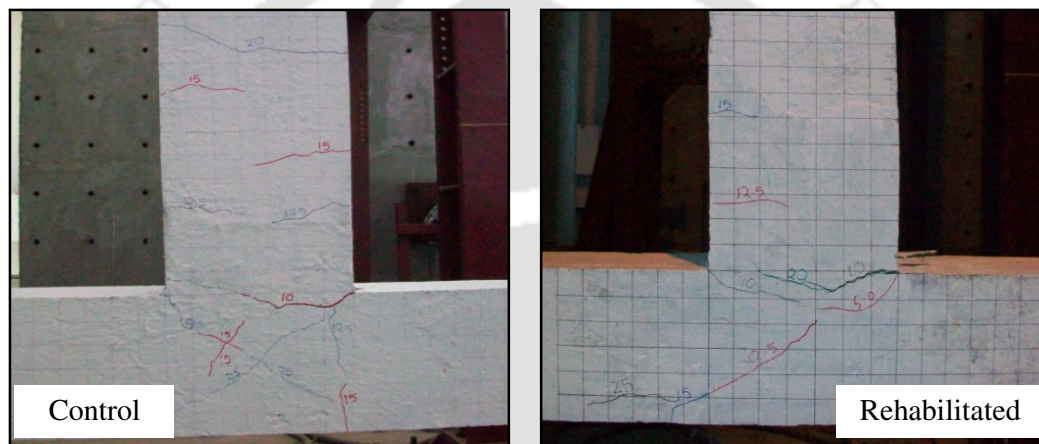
Cracks appearance at initial loading cycles for BWFL specimens under loading type-2
